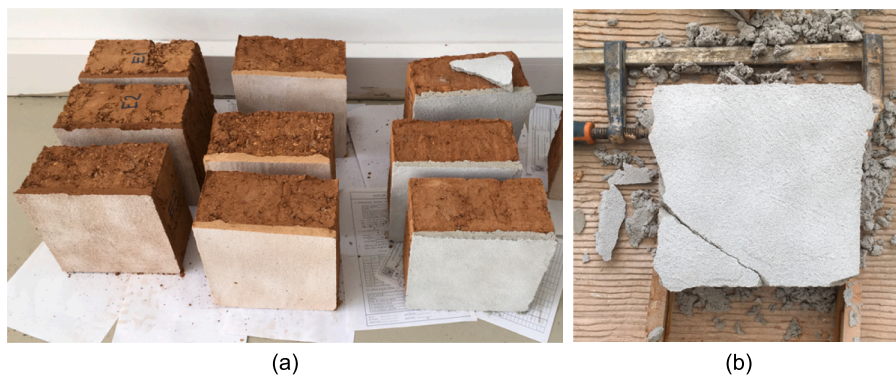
Specimens after monitoring with DIC: (a) general view after 2 weeks; (b) cracking and detachment of the specimen PEC-U.
